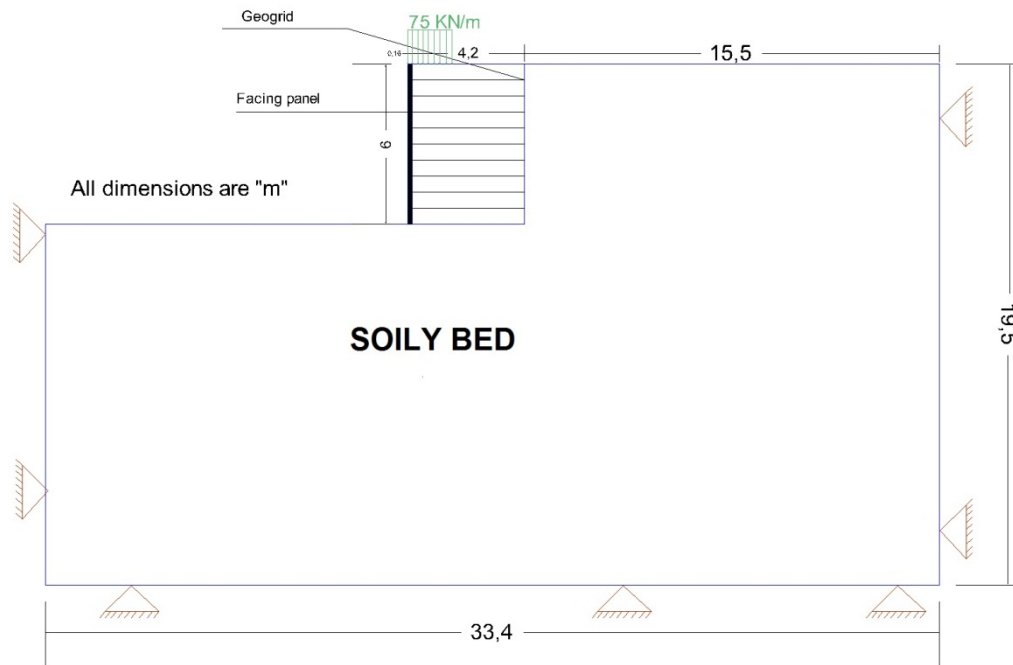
Schematic model of Geogrid reinforced soil retaining wall.
